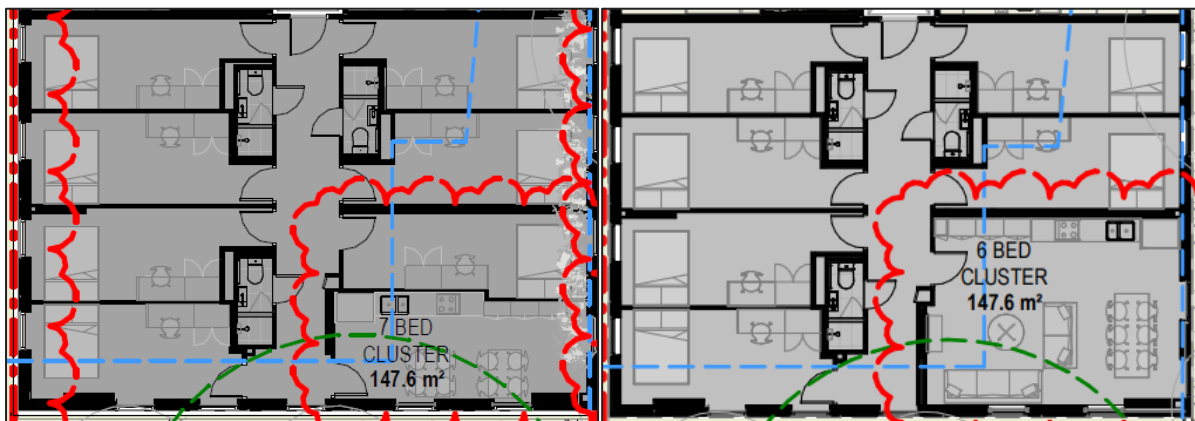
| Approved 7-bed cluster (left) and proposed 6-bed cluster (right) (Source: SSD 9649 MOD 2 Approved Plans and proposed Architectural Plans)
